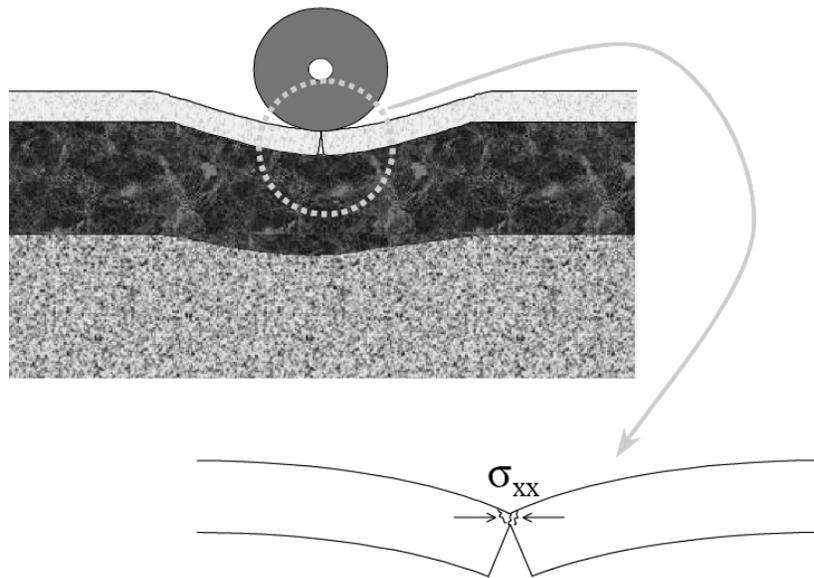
Joint Spalling Mechanisms (Rasmussen et al. 2002)
